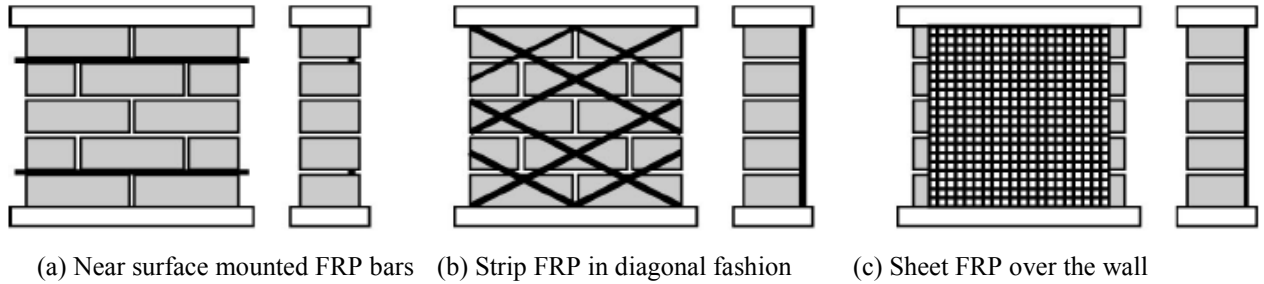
Different techniques of FRP installation on masonry wall walls strength of different FRPs
